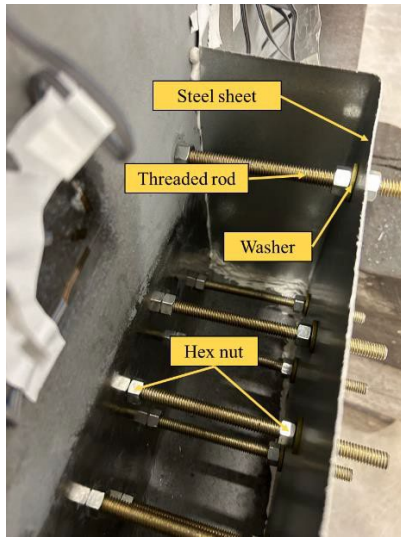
Specimen 3. Details of Sandwich Panel repair assembly.
